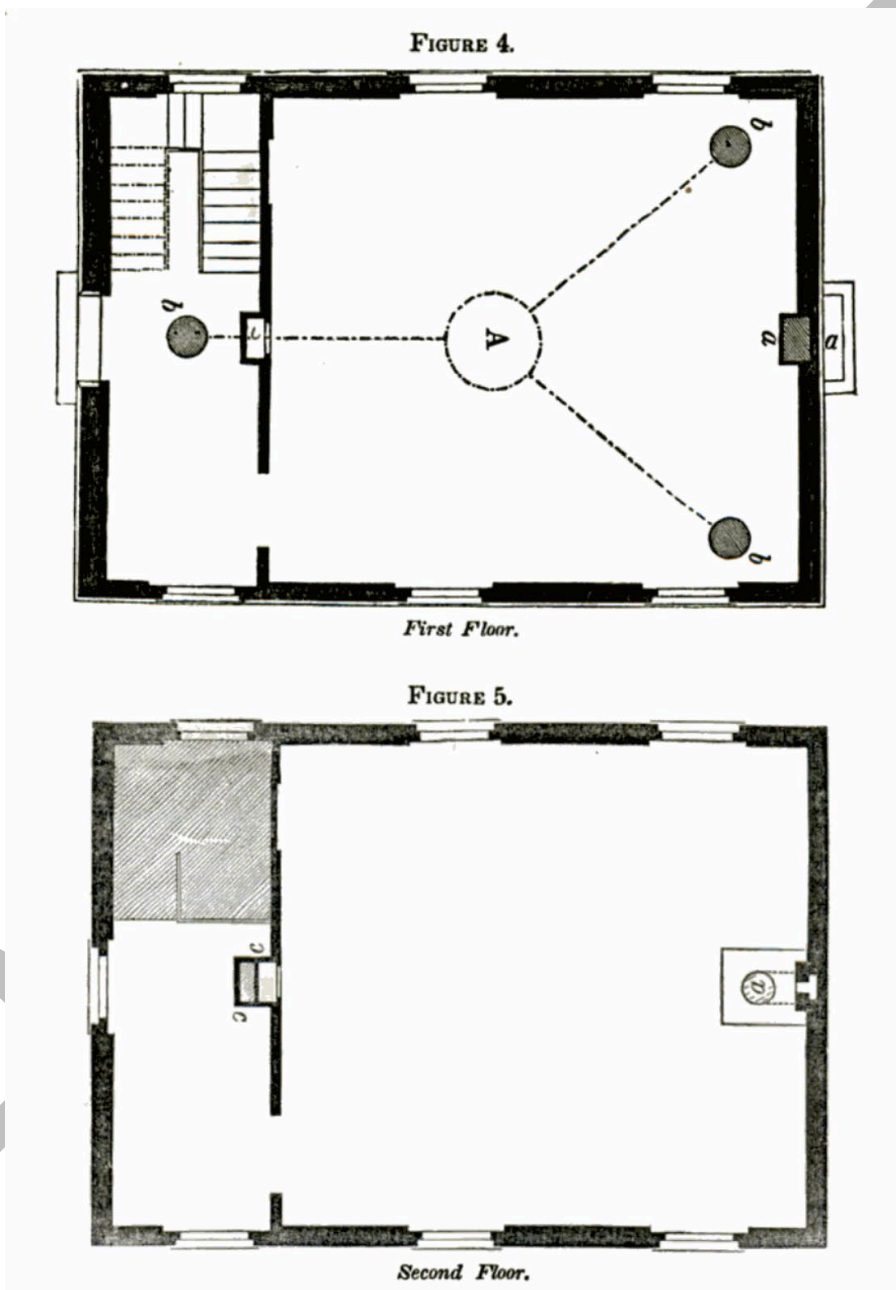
Plan for a model two-story, two-room schoolhouse. Source: Henry Barnard, *School Architecture*. 1848. This plan shares many characteristics of Mount Pleasant School including placing the entry vestibule and stairs at one end of the building. The lettered features relate to the placement of stoves and vents since Barnard considered warmth and ventilation were considered key attributes of a proper building.
